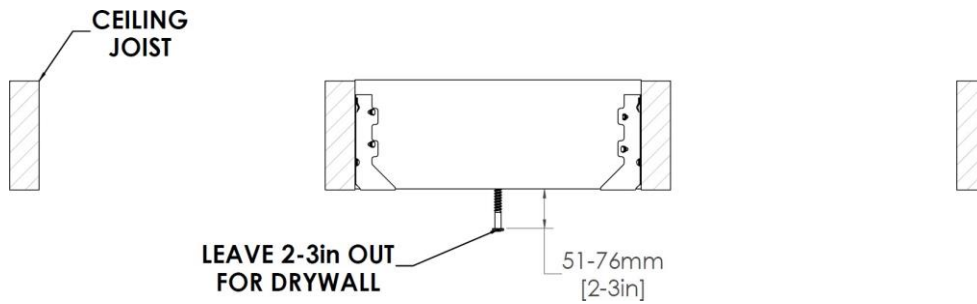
Structural Wood Screw or Lag Bolt Extending 2"–3" Below Joist, so Ceiling Drywall Can Be Installed Around Them
